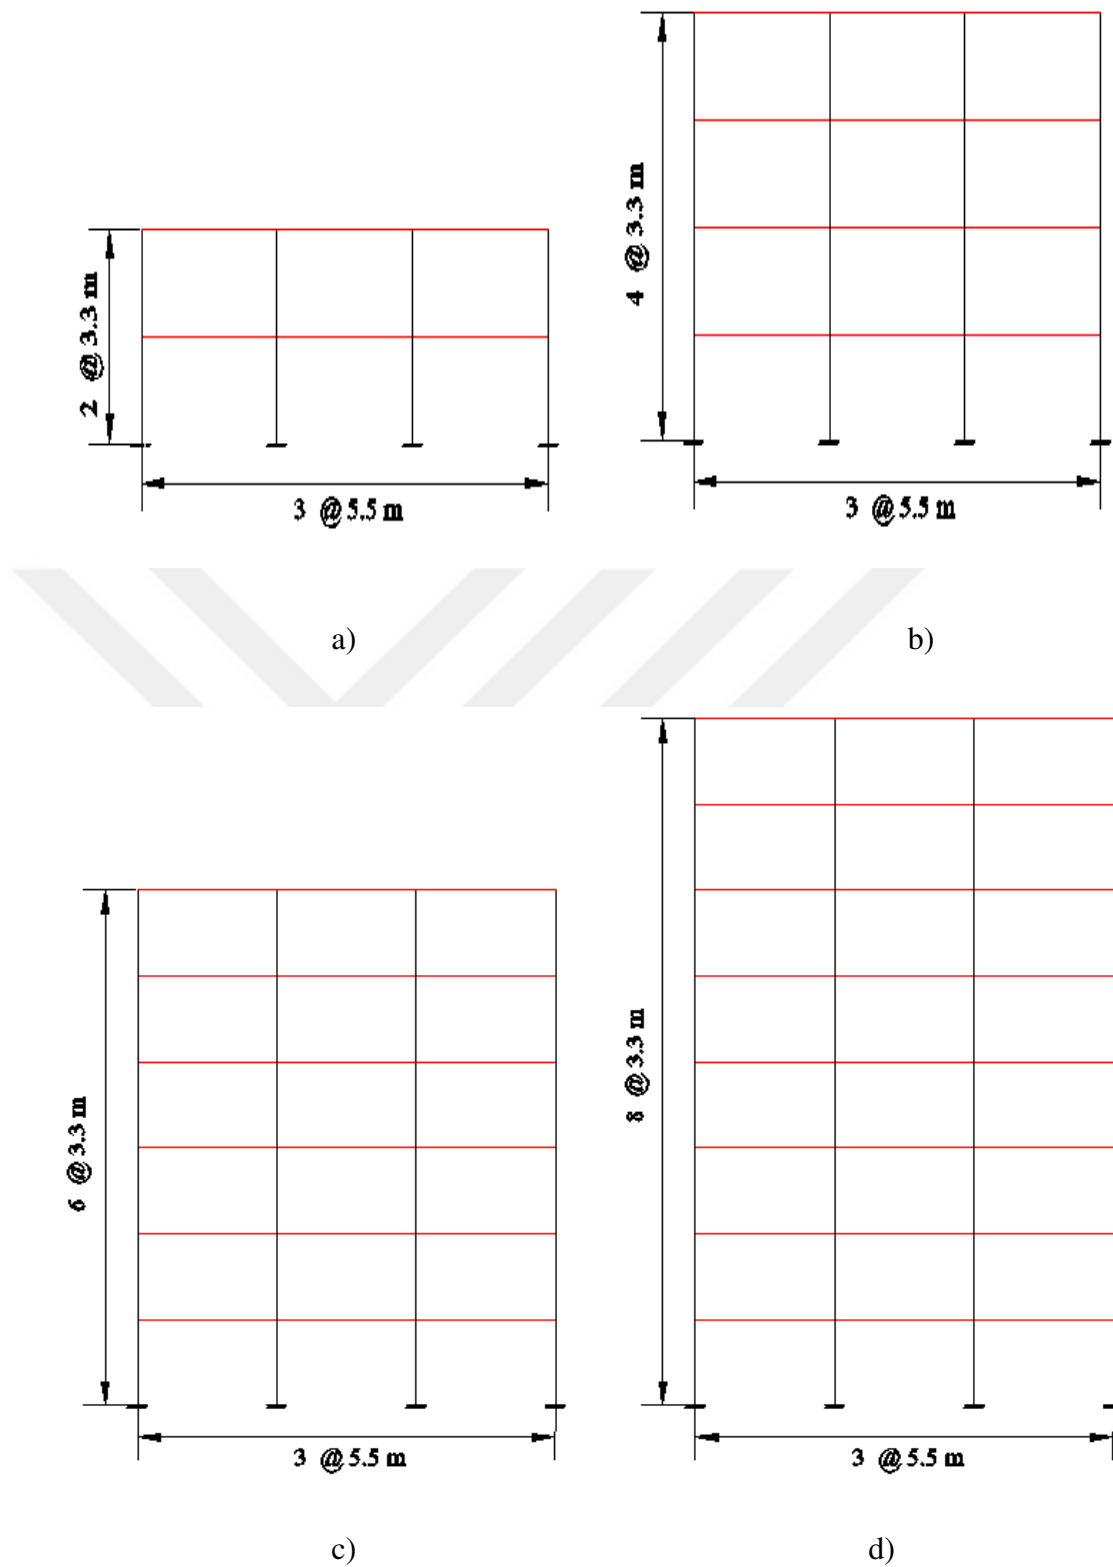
Frame elevation of the existing building x-z axes in (a) 2 stores, (b) 4 storey, (c) 6 storey, and (d) 8 storey
